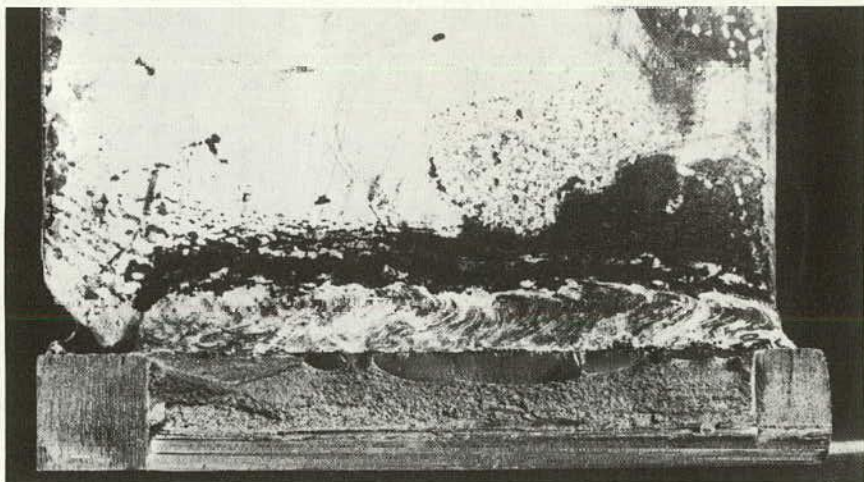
Multiple fatigue crack growth at the toe of Type 3 stiffener-to-tension flange weld.
